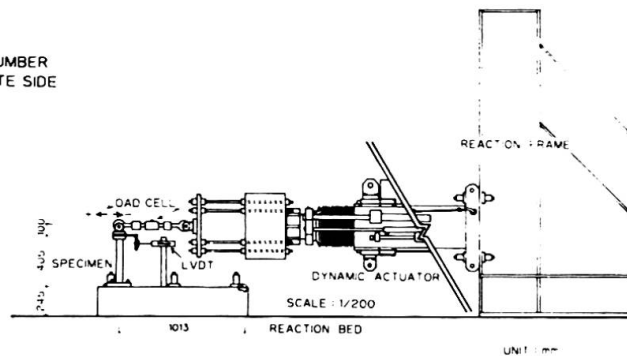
Test Setup for Dynamic and Quasi-Static Loading Tests
